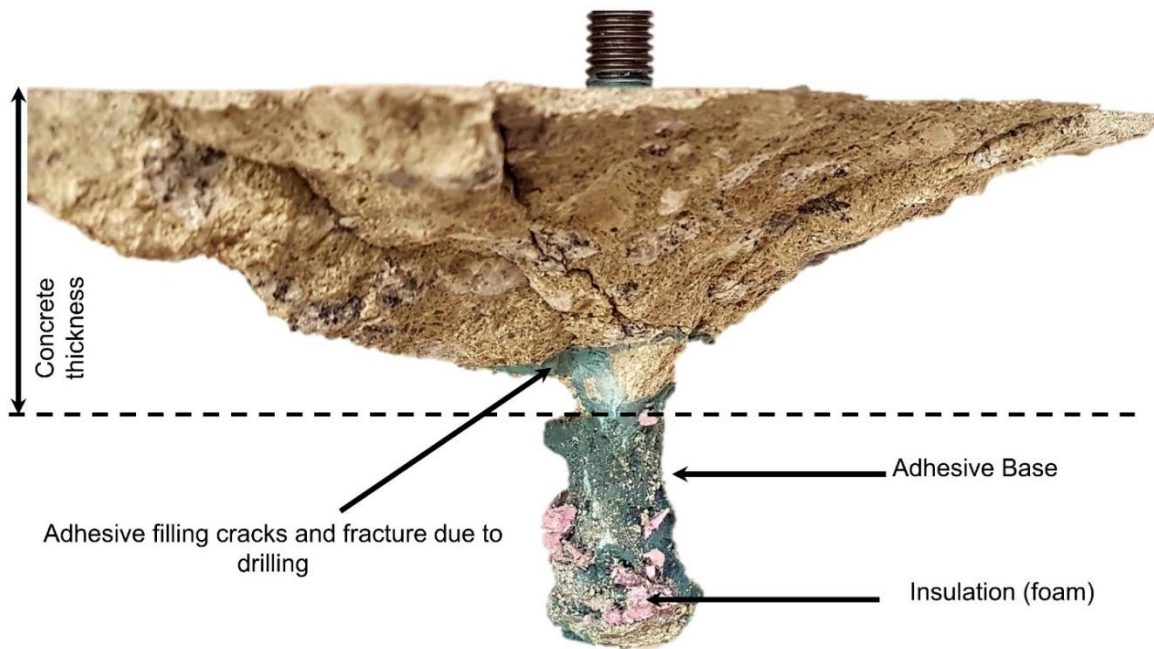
Adhesive filled cracks due to back-face blowout and created a base in the foam layer.
